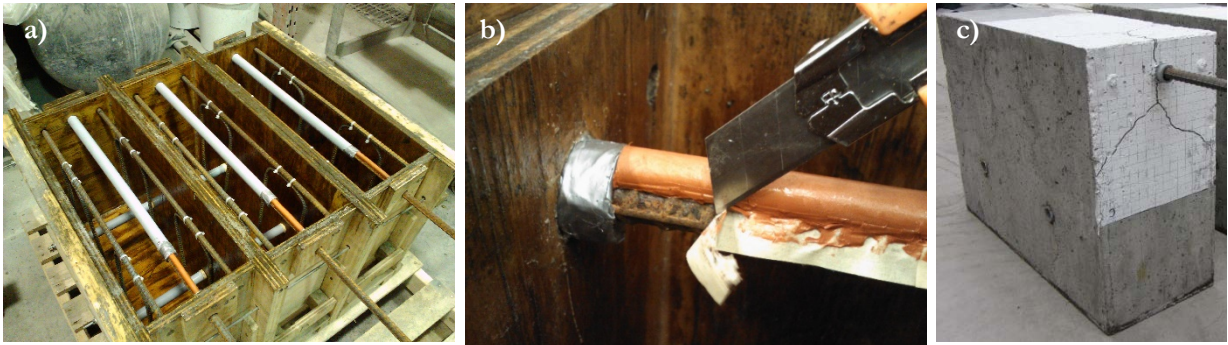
(a) Interior reinforcement of “beam-end” specimens (b) installation of the silicone insert and (c) concrete splitting failure
